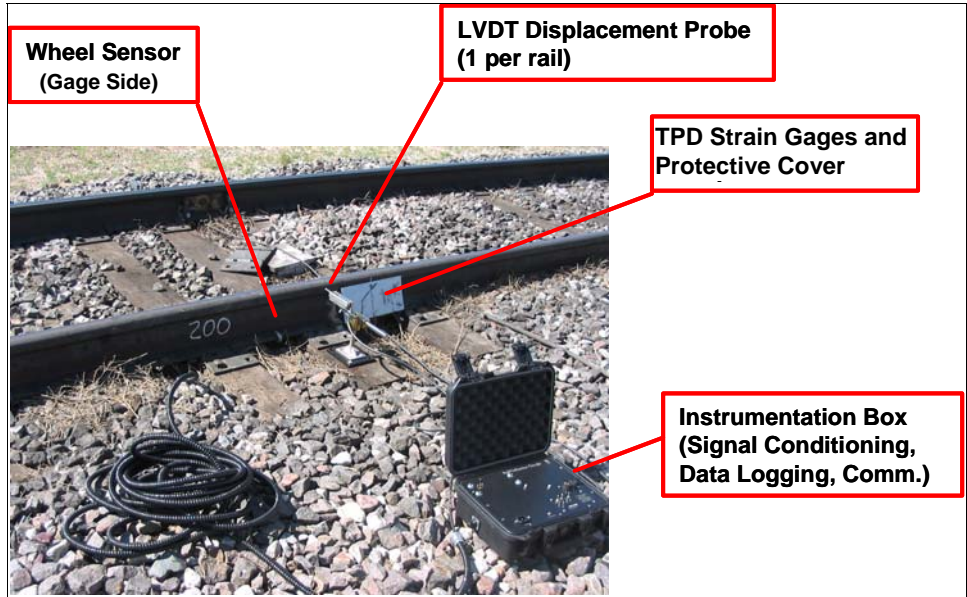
RDG Installation at Section 25, Tie 199 (RDG Site 1, Co-Located with TPD)
